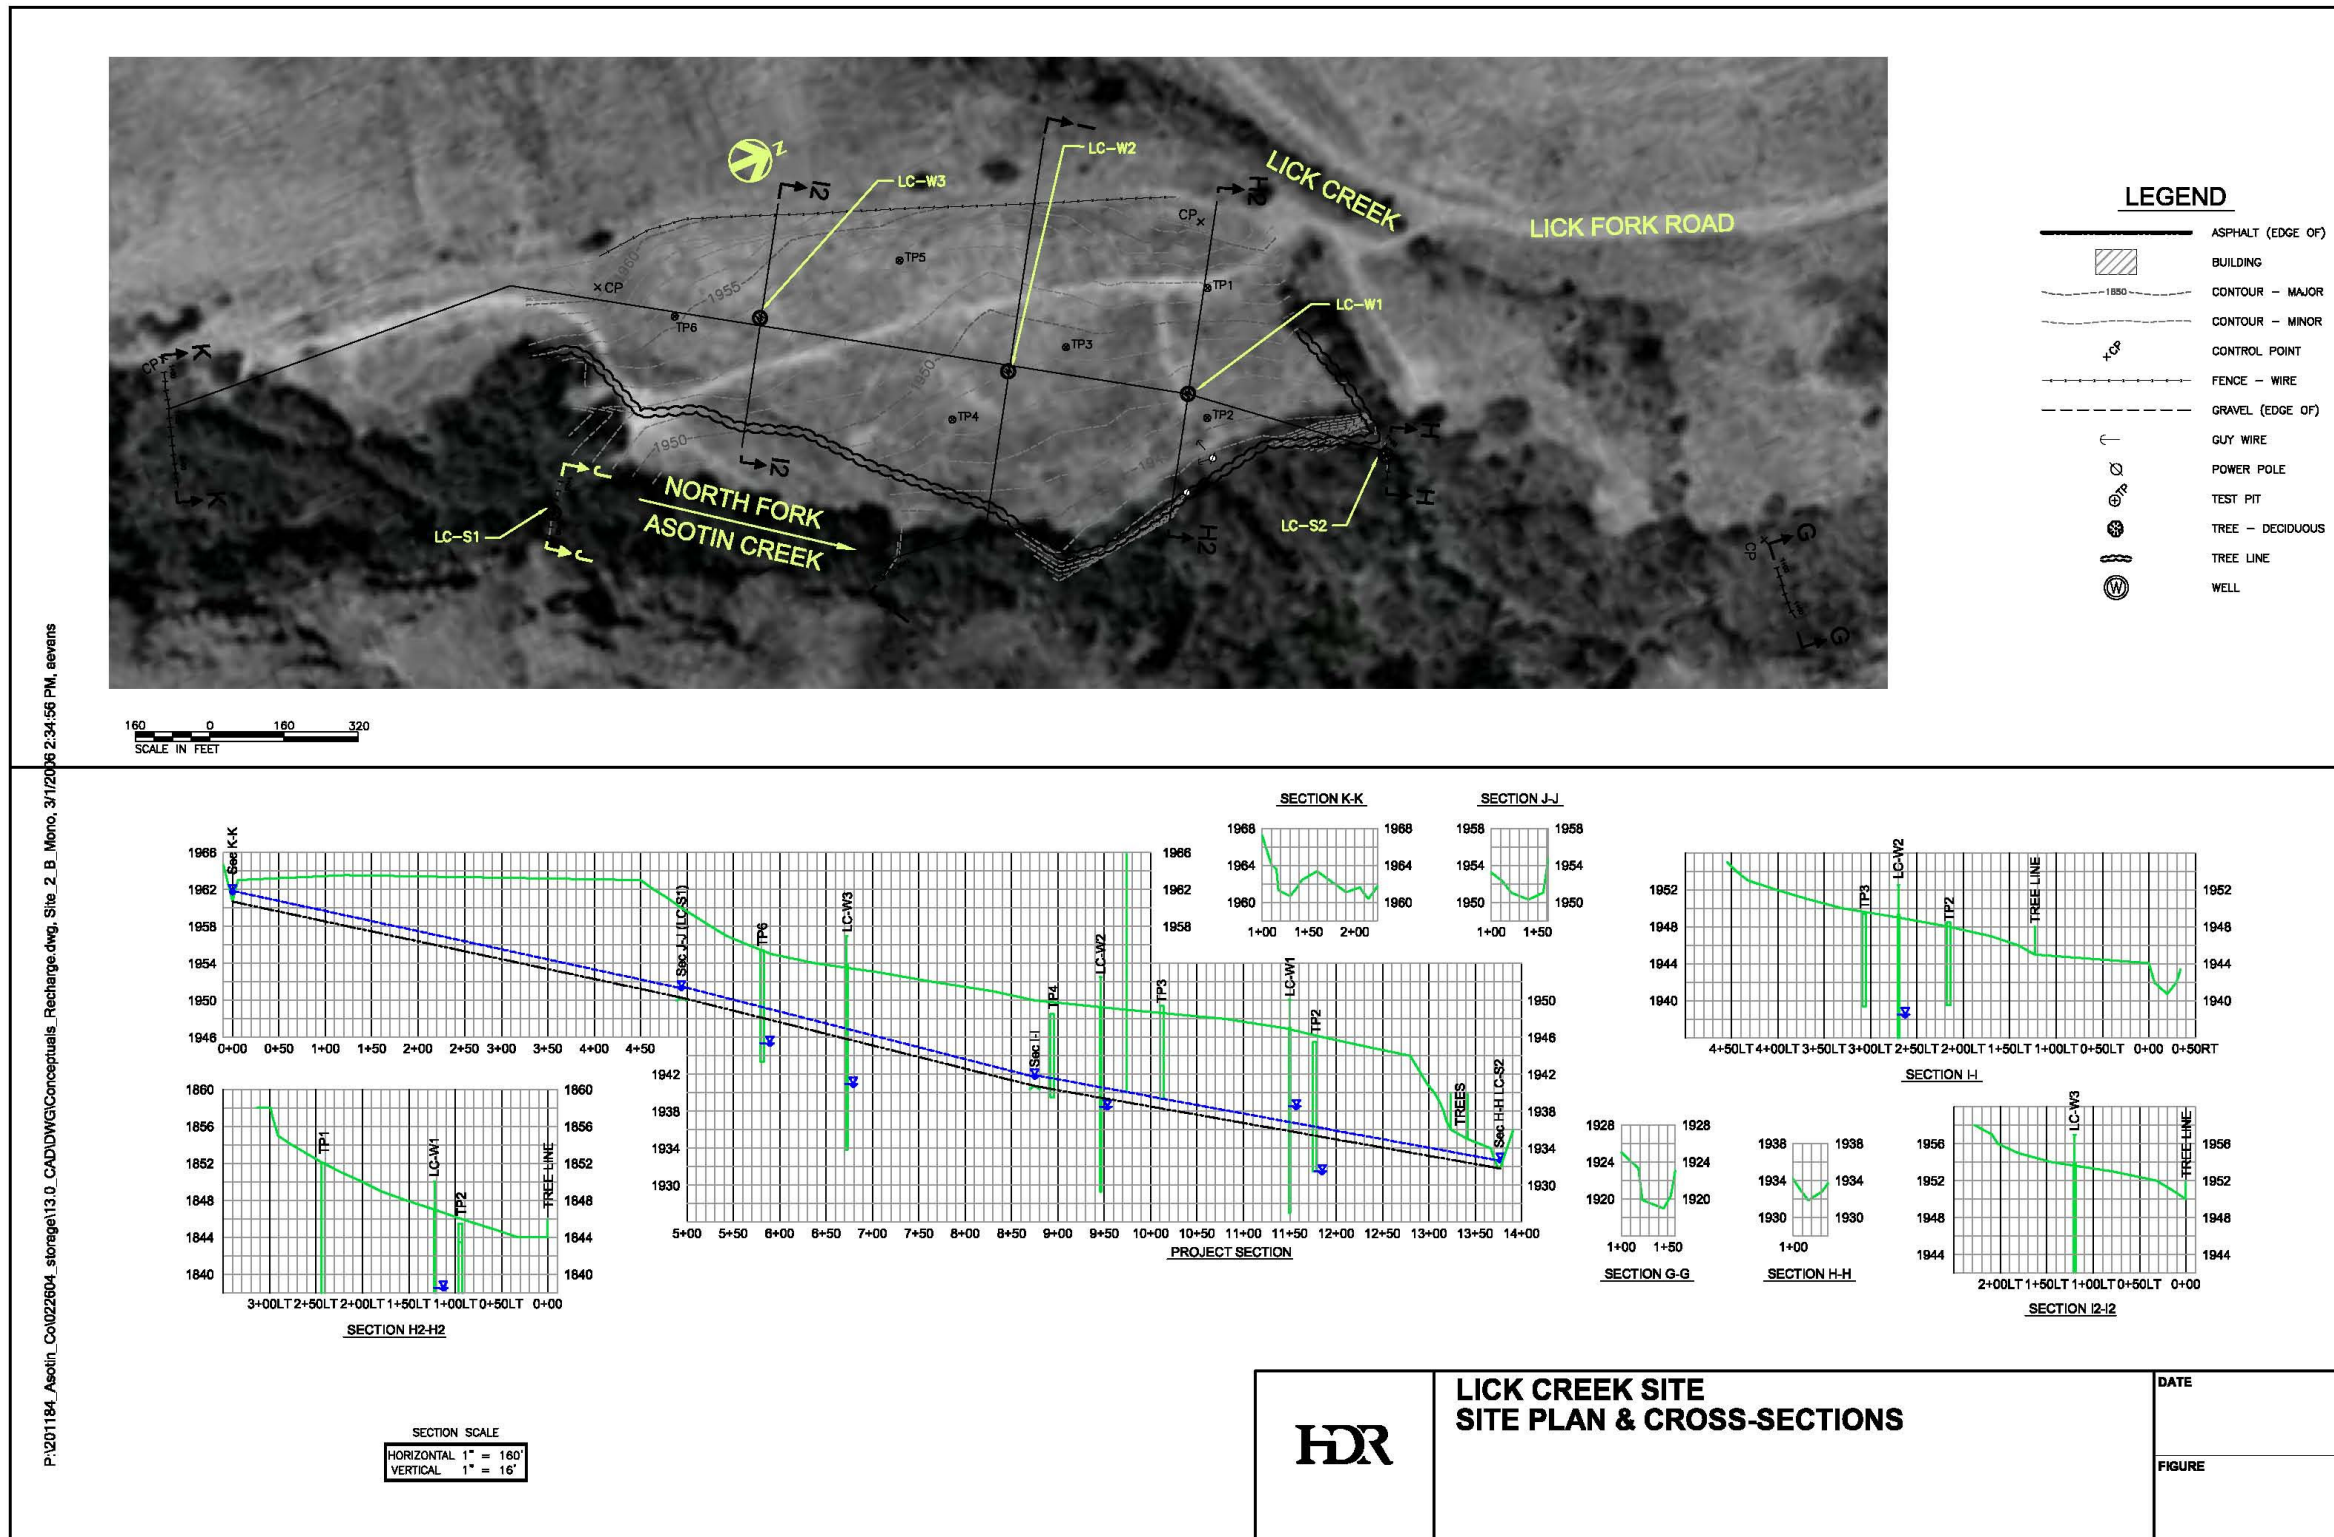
Site plan, topography and cross-sections for Site 2- Lick Creek Site
